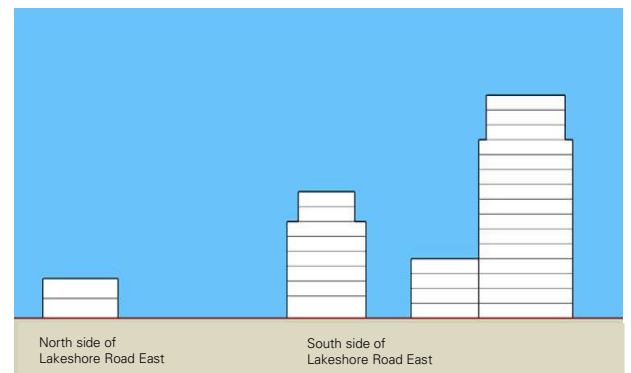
Development in the Lakeview Waterfront along Lakeshore Road East with an 8 storey building and a 15 storey building behind.
